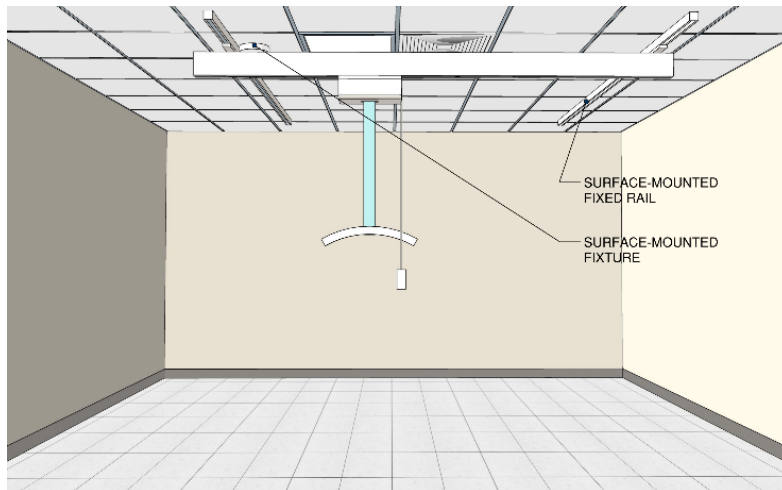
Surface-mounted configuration – for traverse lift systems, this installation allows for a typical 4” gap between the top of the traverse rail and the ceiling plane. With this configuration, small protrusions from the ceiling plane such as smoke detectors, light fixtures and air distribution grilles can be accommodated. Surface-mounted or partially recessed sprinkler heads may require verification for clearance. The distance between the bottom of the traverse rail and the floor must be verified as acceptable by the manufacturer and SPHM Facility Coordinator for lift functionality. This installation is typically supported above-ceiling but may also be combined with wall-mounted or floor-mounted support systems.
